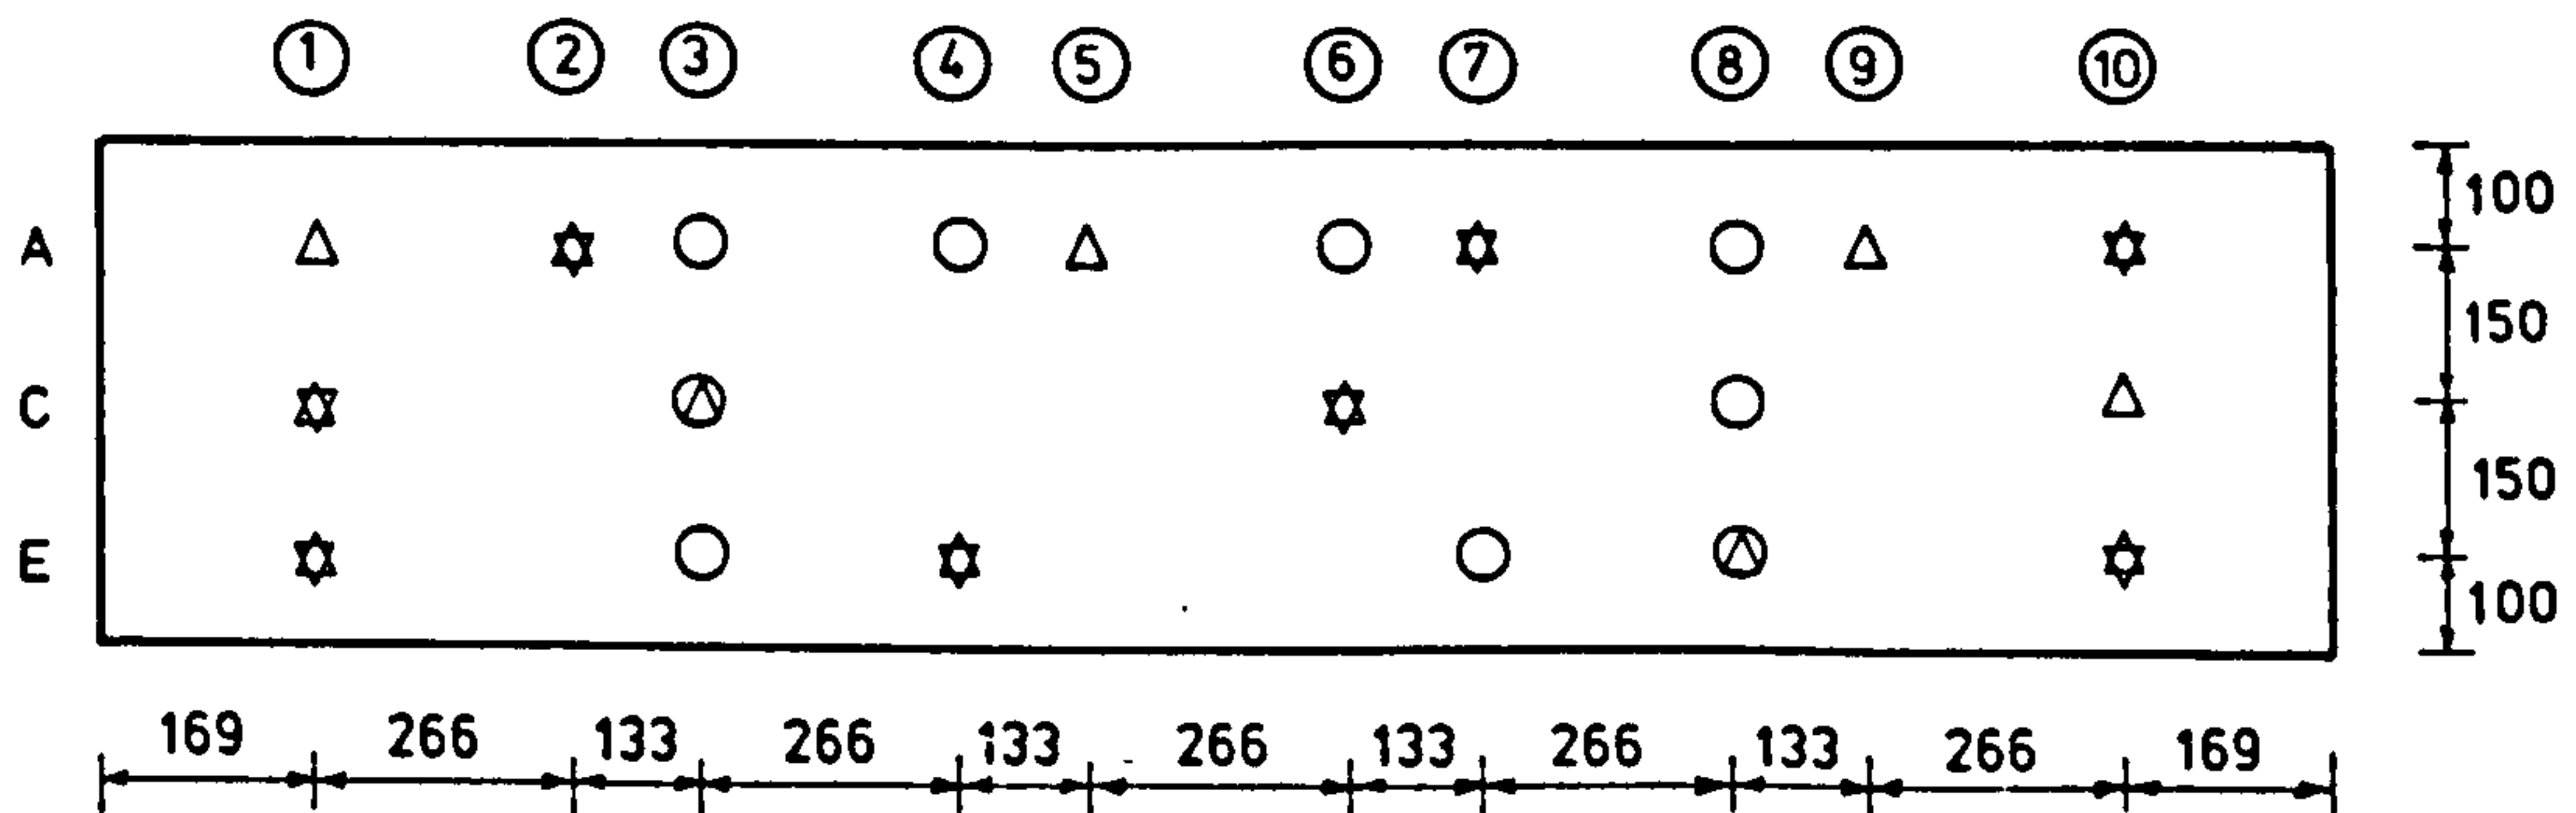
Grid layout of rebound hammer tests for different types of concrete beam tested at 28 days DIMENSIONS IN mm
